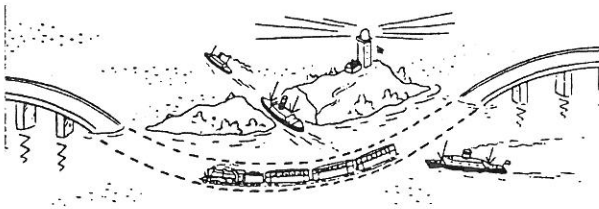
A newspaper "proposal" for the layout of the Link in 1952
